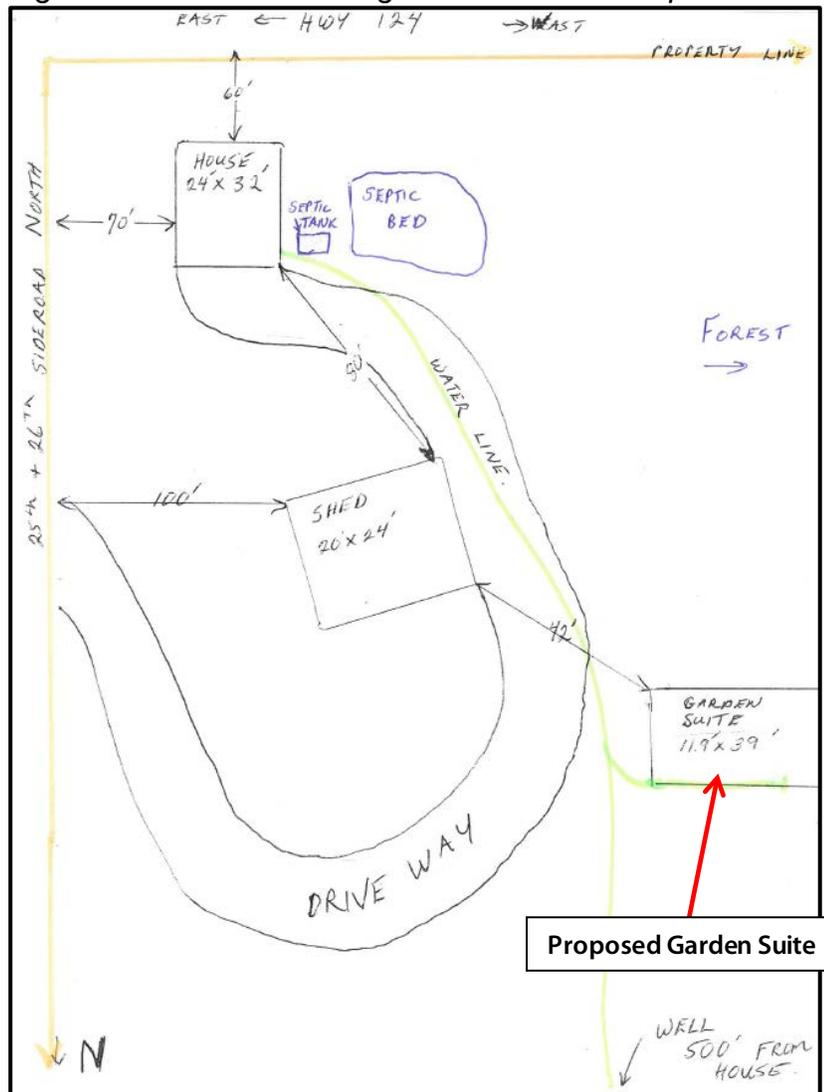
Sketch of Existing Structures and Proposed Garden Suite
